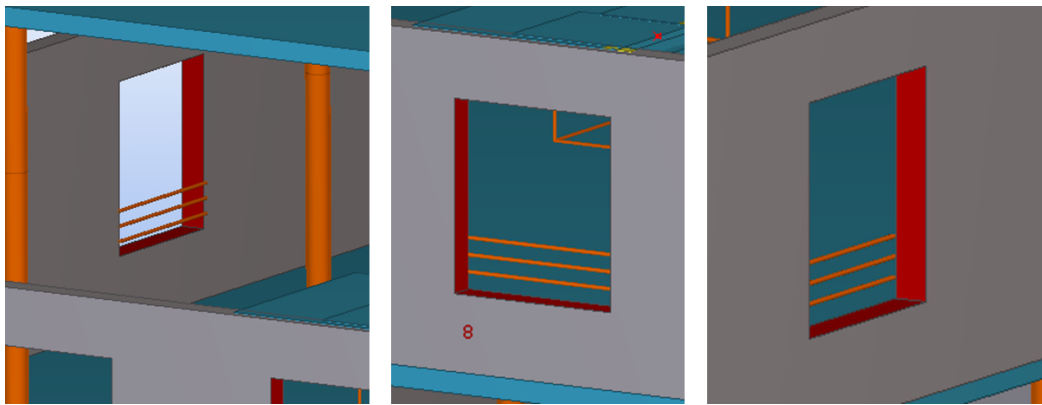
Examples of exterior wall openings and guardrail protection system in place.
